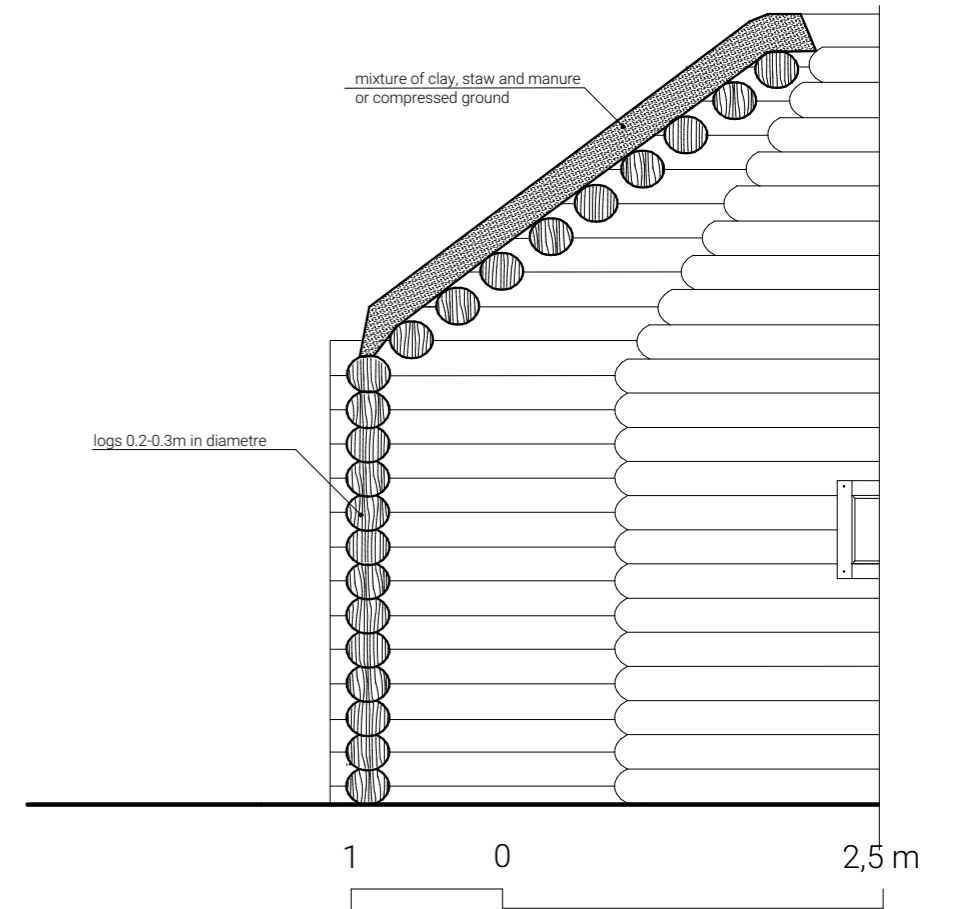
a section of a "wooden urasa". Locals combine together two typical residential buildings: urasa and traditional Russian house. The dwelling has a similar to the Russian wooden hut construction method where logs were connected by cog joint, however, the house does not have a basement and the roof is following the shape of the traditional summer house of the local population – urasa with layer of the pressed ground for extra insulation.
